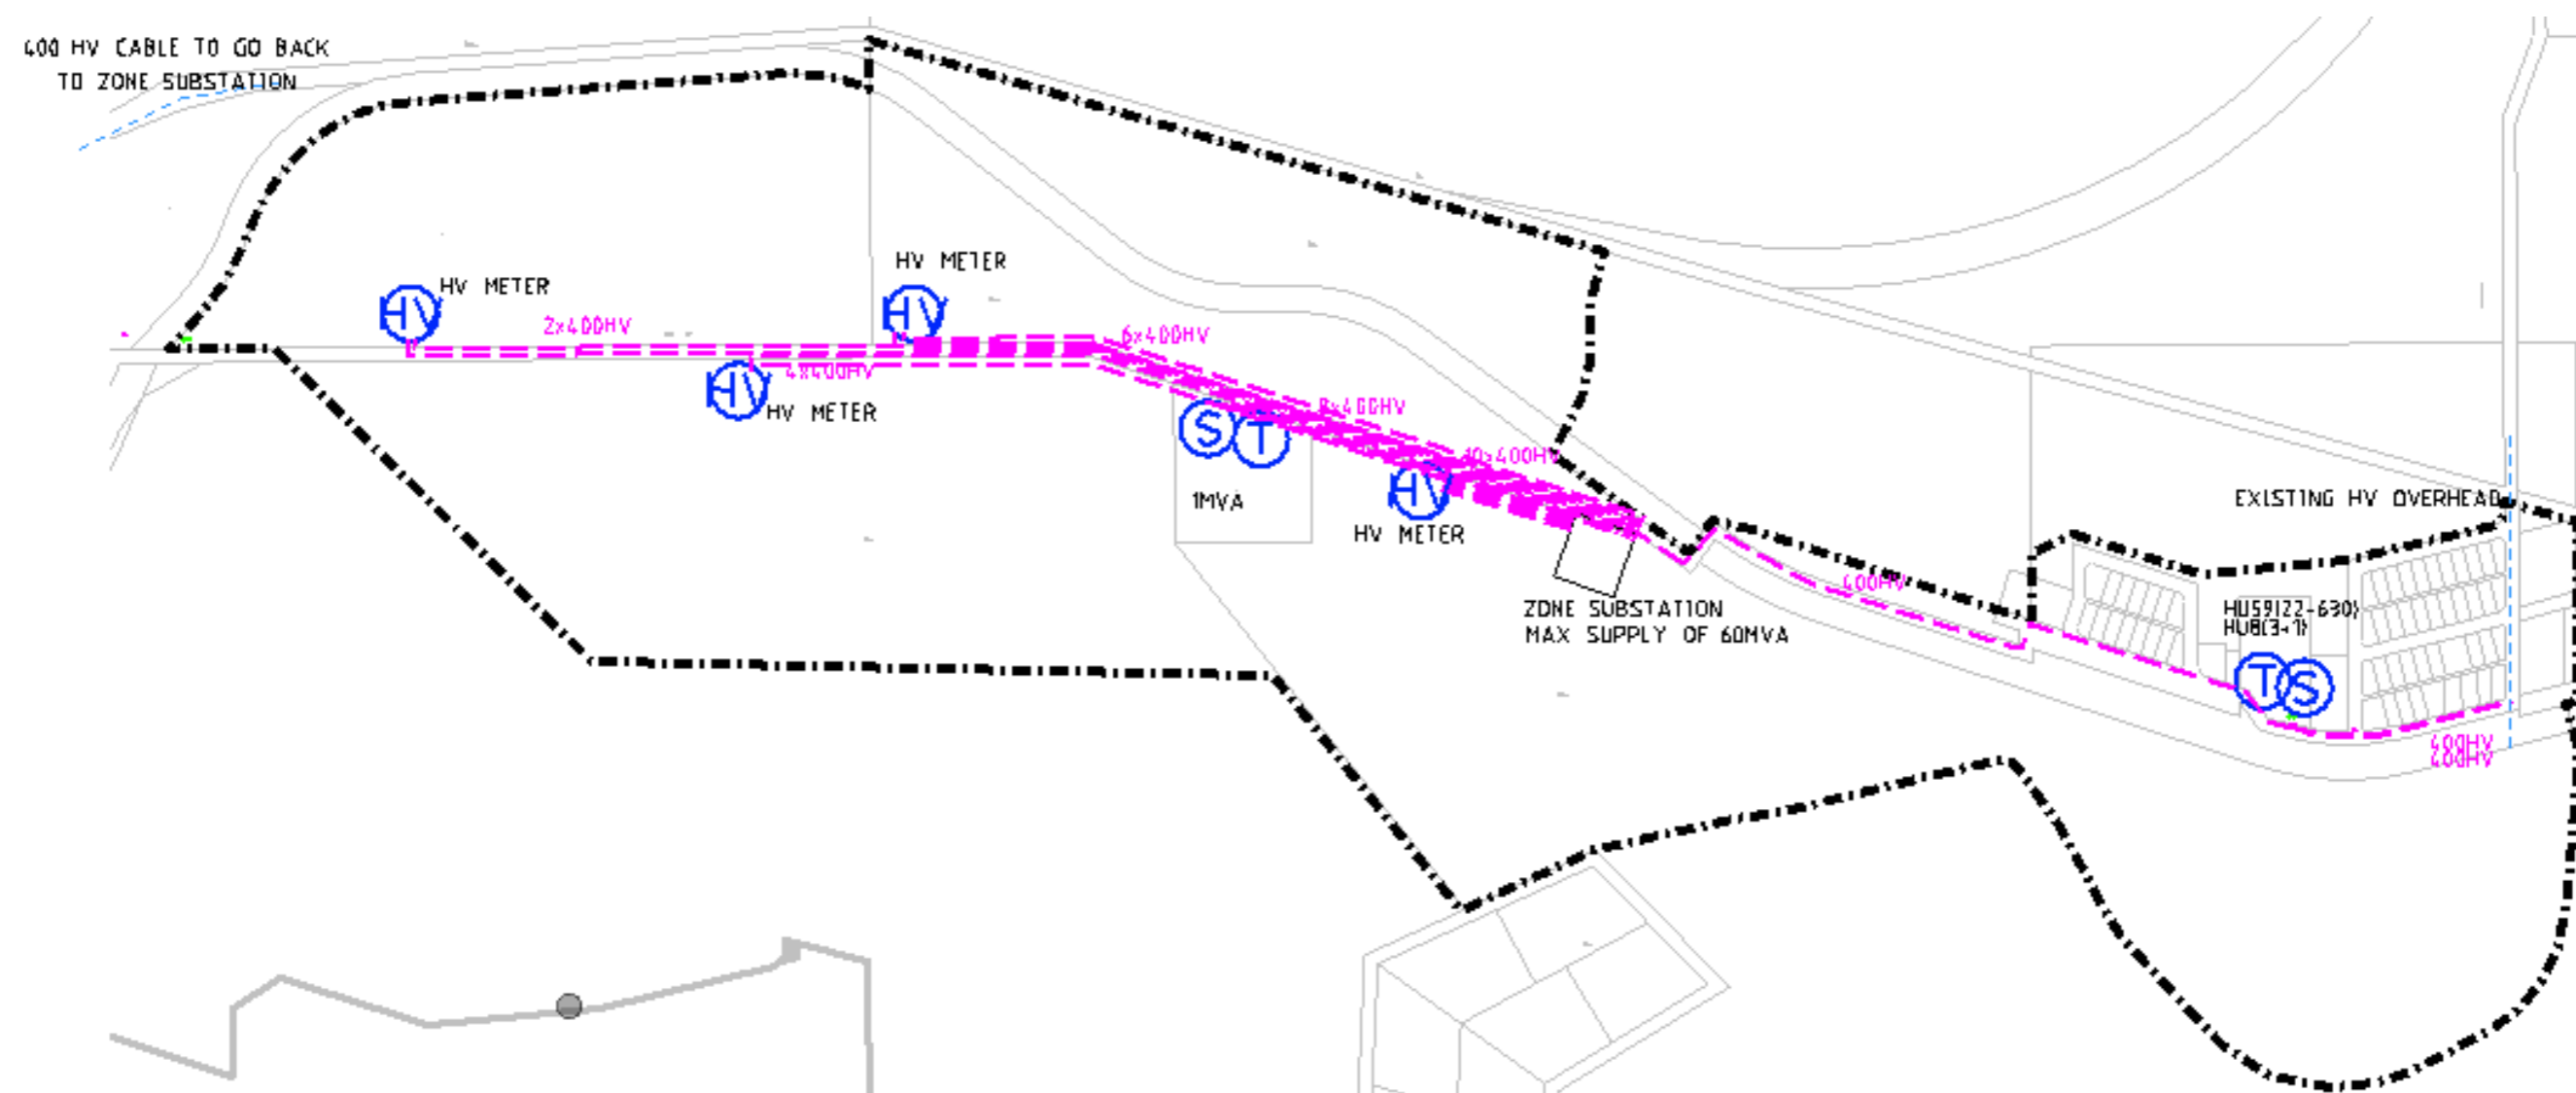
HV Concept Plan for 15MVA to 60MVA load requirement
